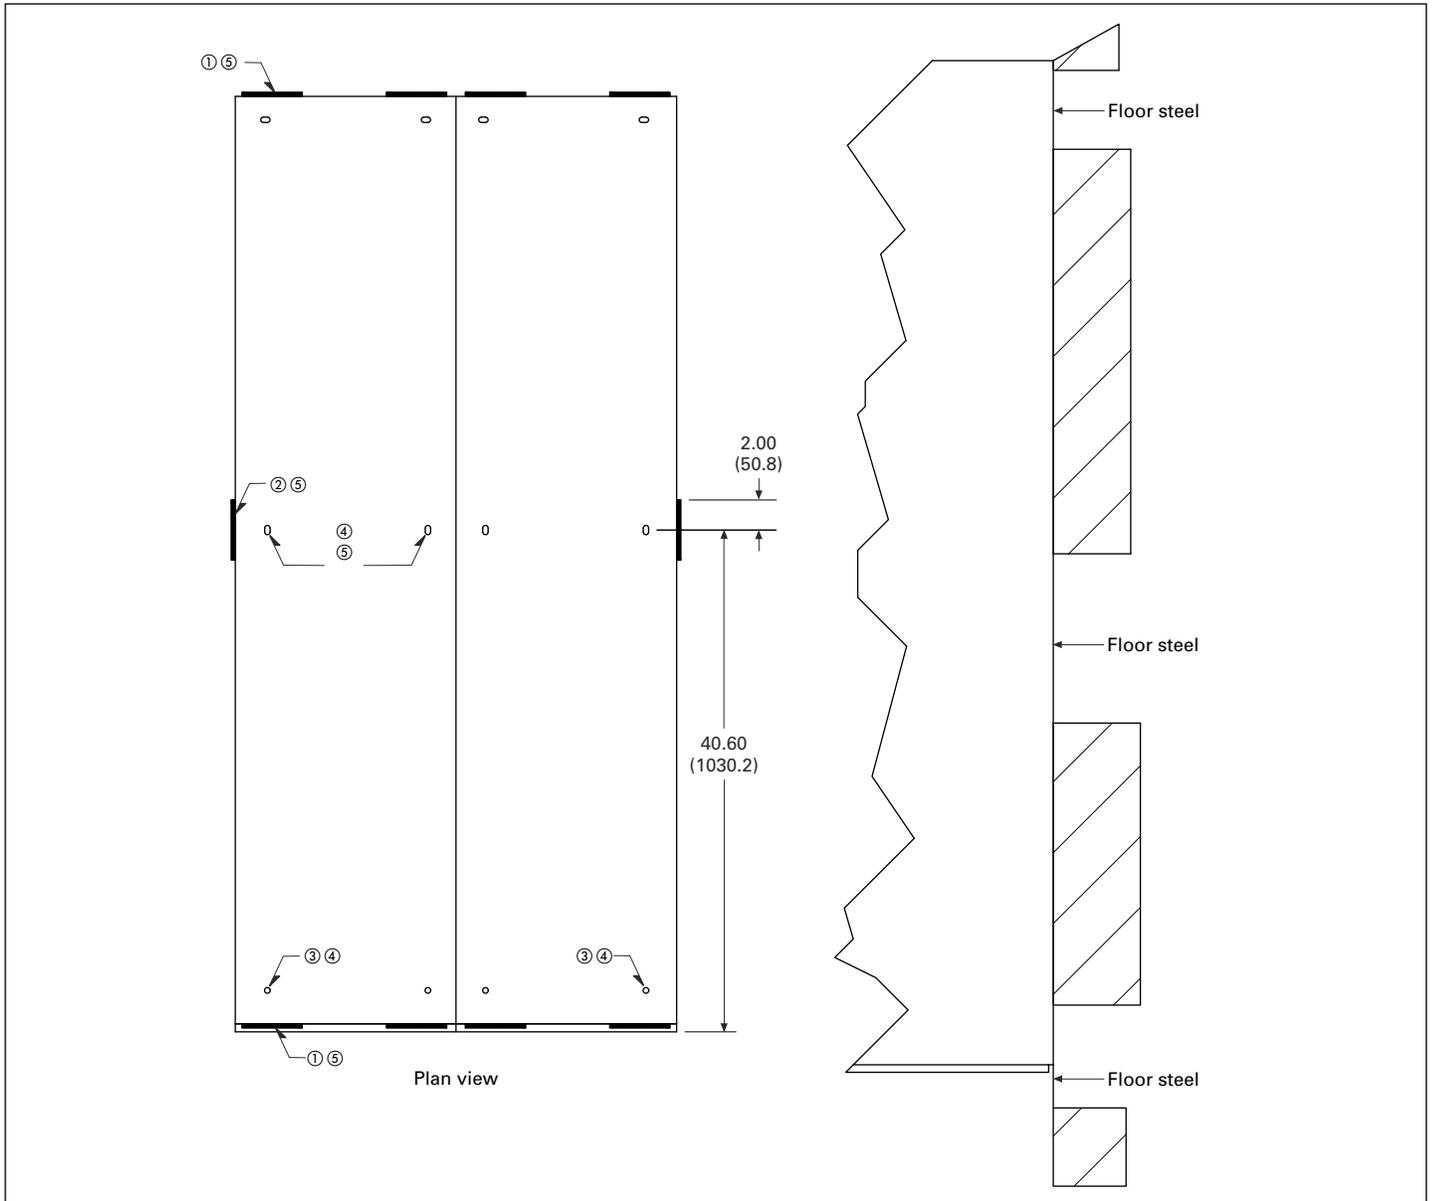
Welding of indoor structures to imbedded floor steel—rear-access MDSL
